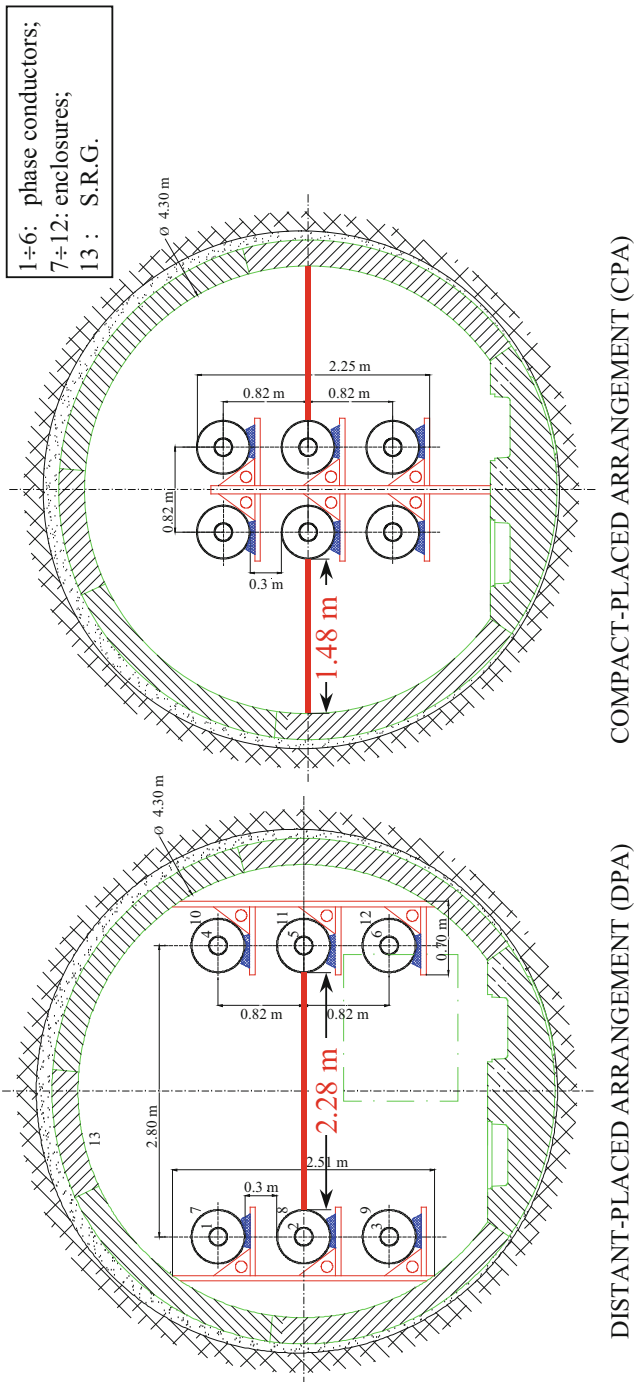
Possible arrangement installations of double-circuit GIL
